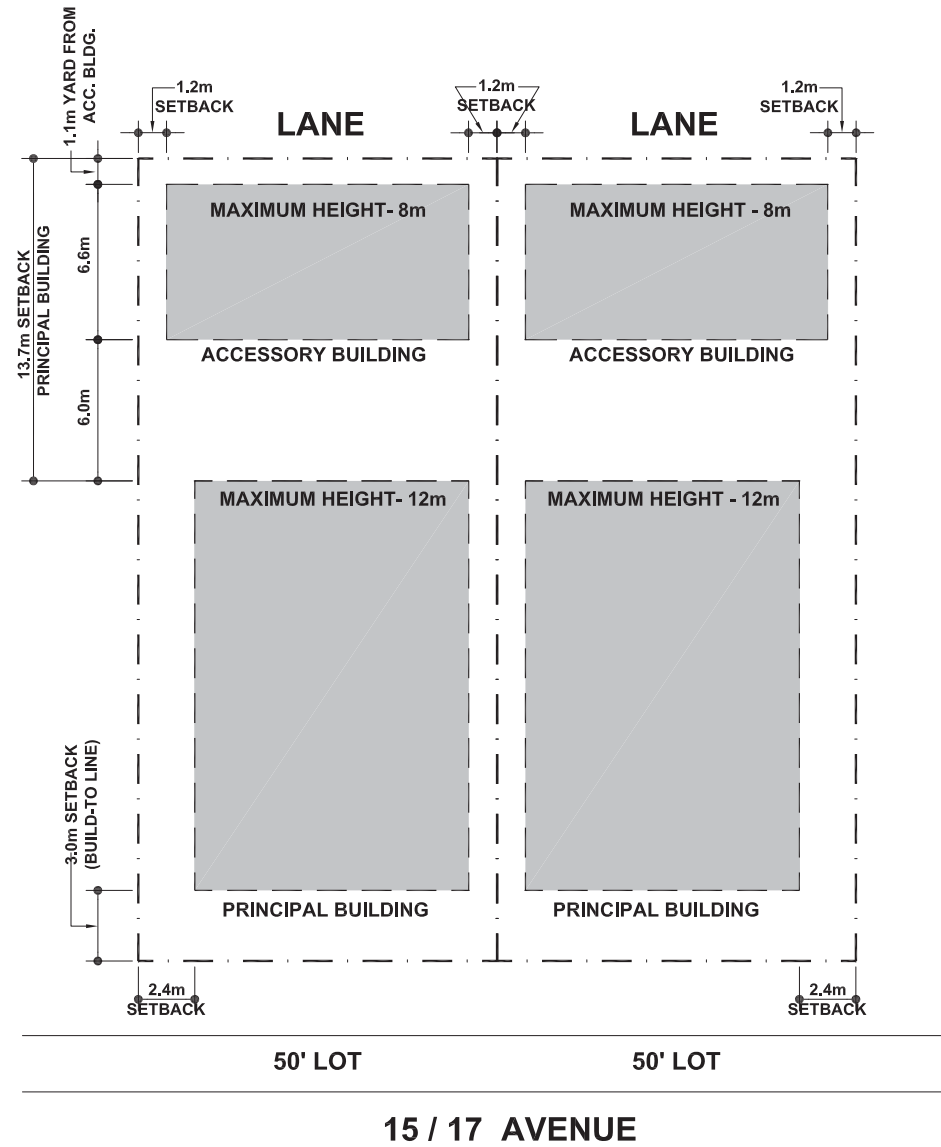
Building Form Example – Multi-residential/Carriage Houses
